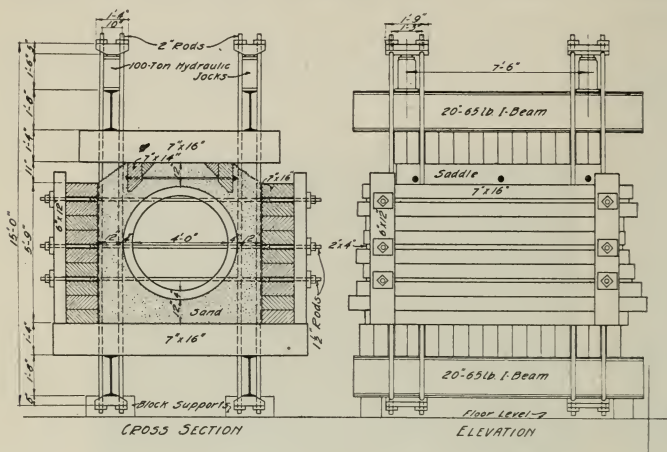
HYDRAULIC JACK TESTING MACHINE.
